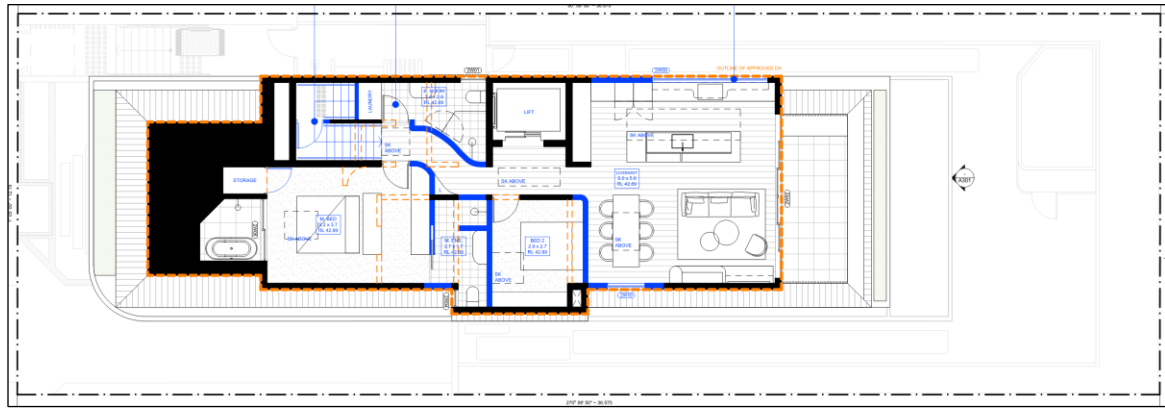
Proposed second floor plan (source: Common Office, dated 5/11/2025)
